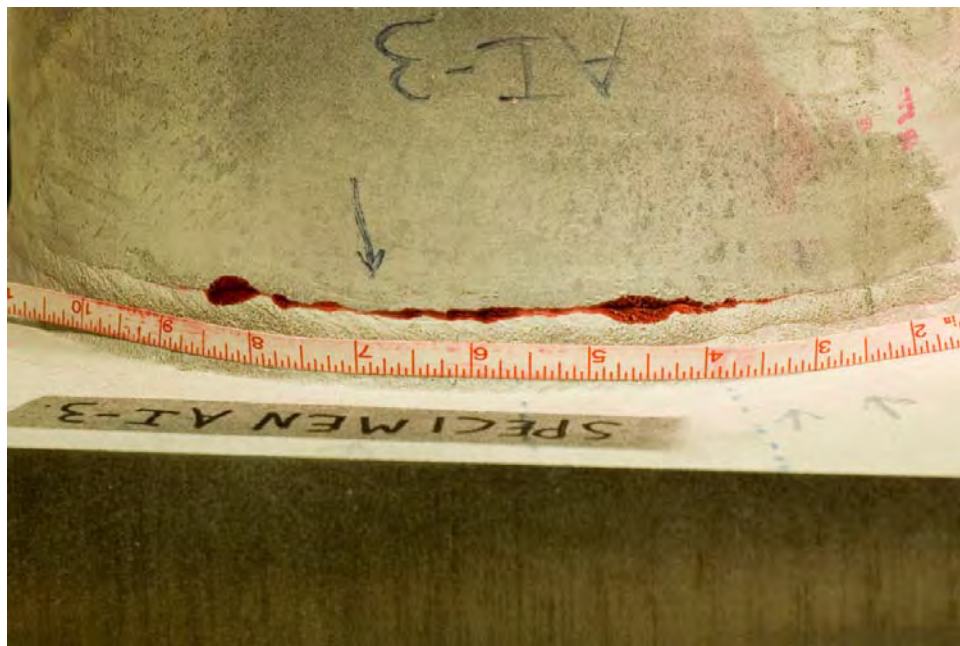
Fatigue crack from the fillet weld termination on the tube wall in arm pole-to-transverse plate socket connection in Specimen Type I
